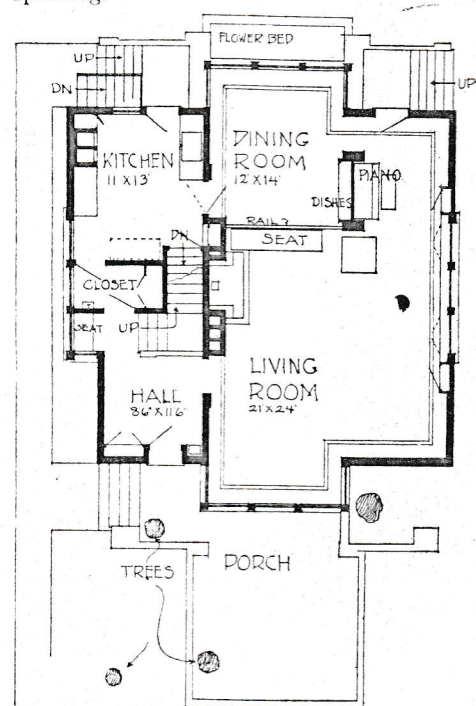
FIRST FLOOR PLAN—OWN HOUSE AT RIVER FOREST, ILL.
